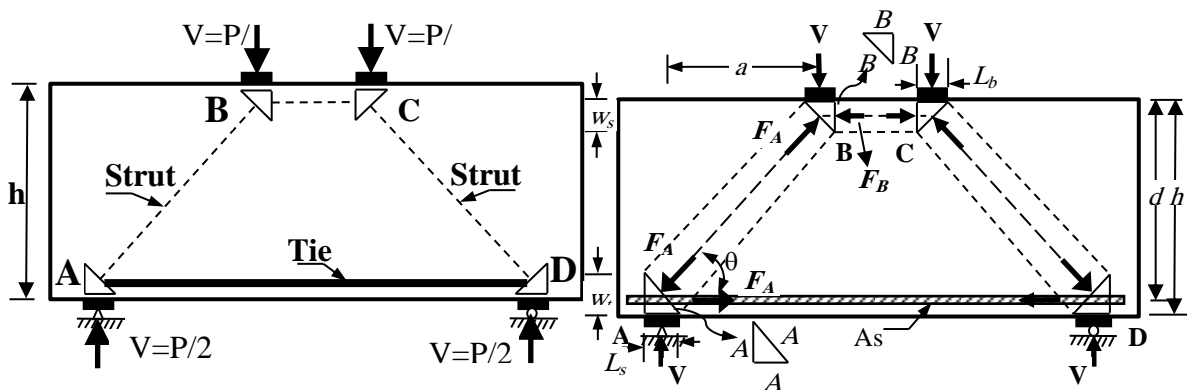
Preliminary truss layout (struts and tie model) of deep beam.
